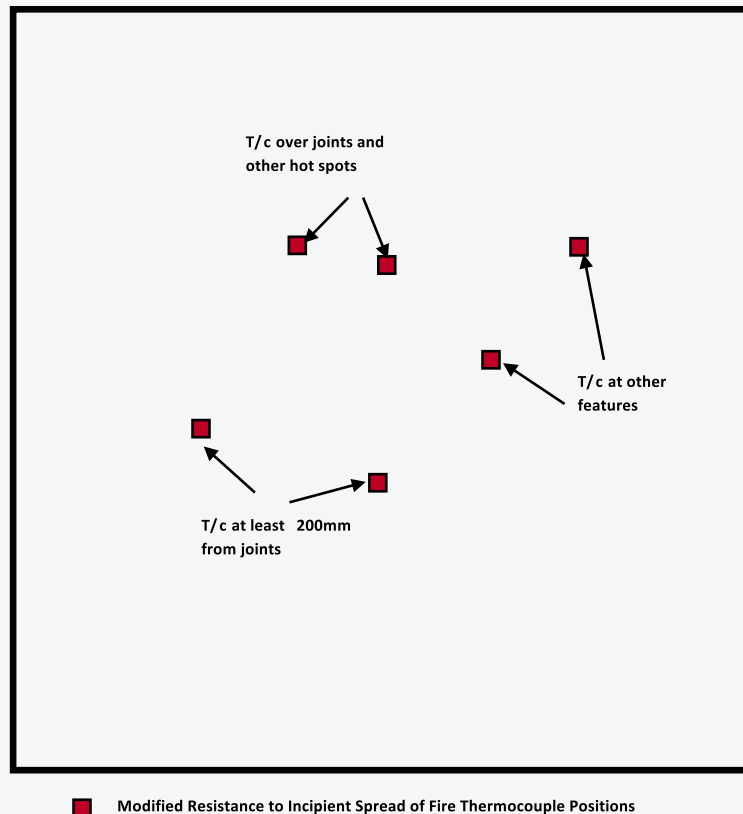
Elevation of a wall showing modified RISF thermocouple positions.
